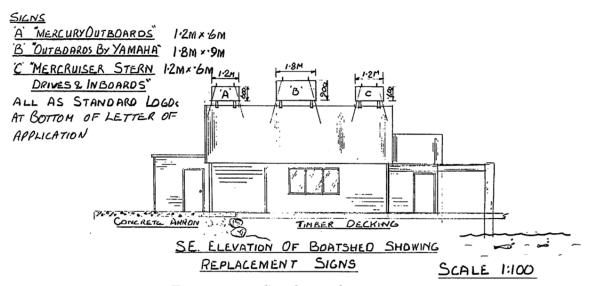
Southern elevation 1993 submitted with DA for the installation of new signage.
